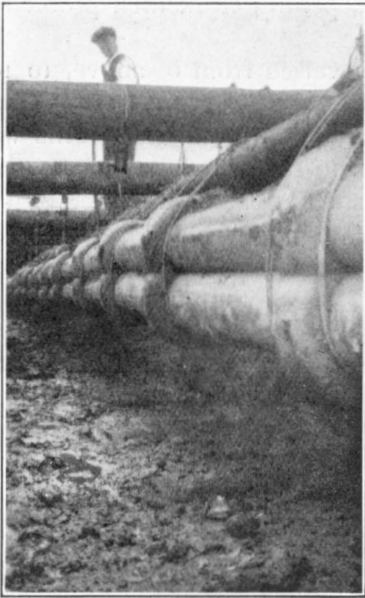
DUCTS SUSPENDED AND TRENCH DEEPENED ALONGSIDE AND UNDER DUCTS ON STRAIGHT SECTION.
